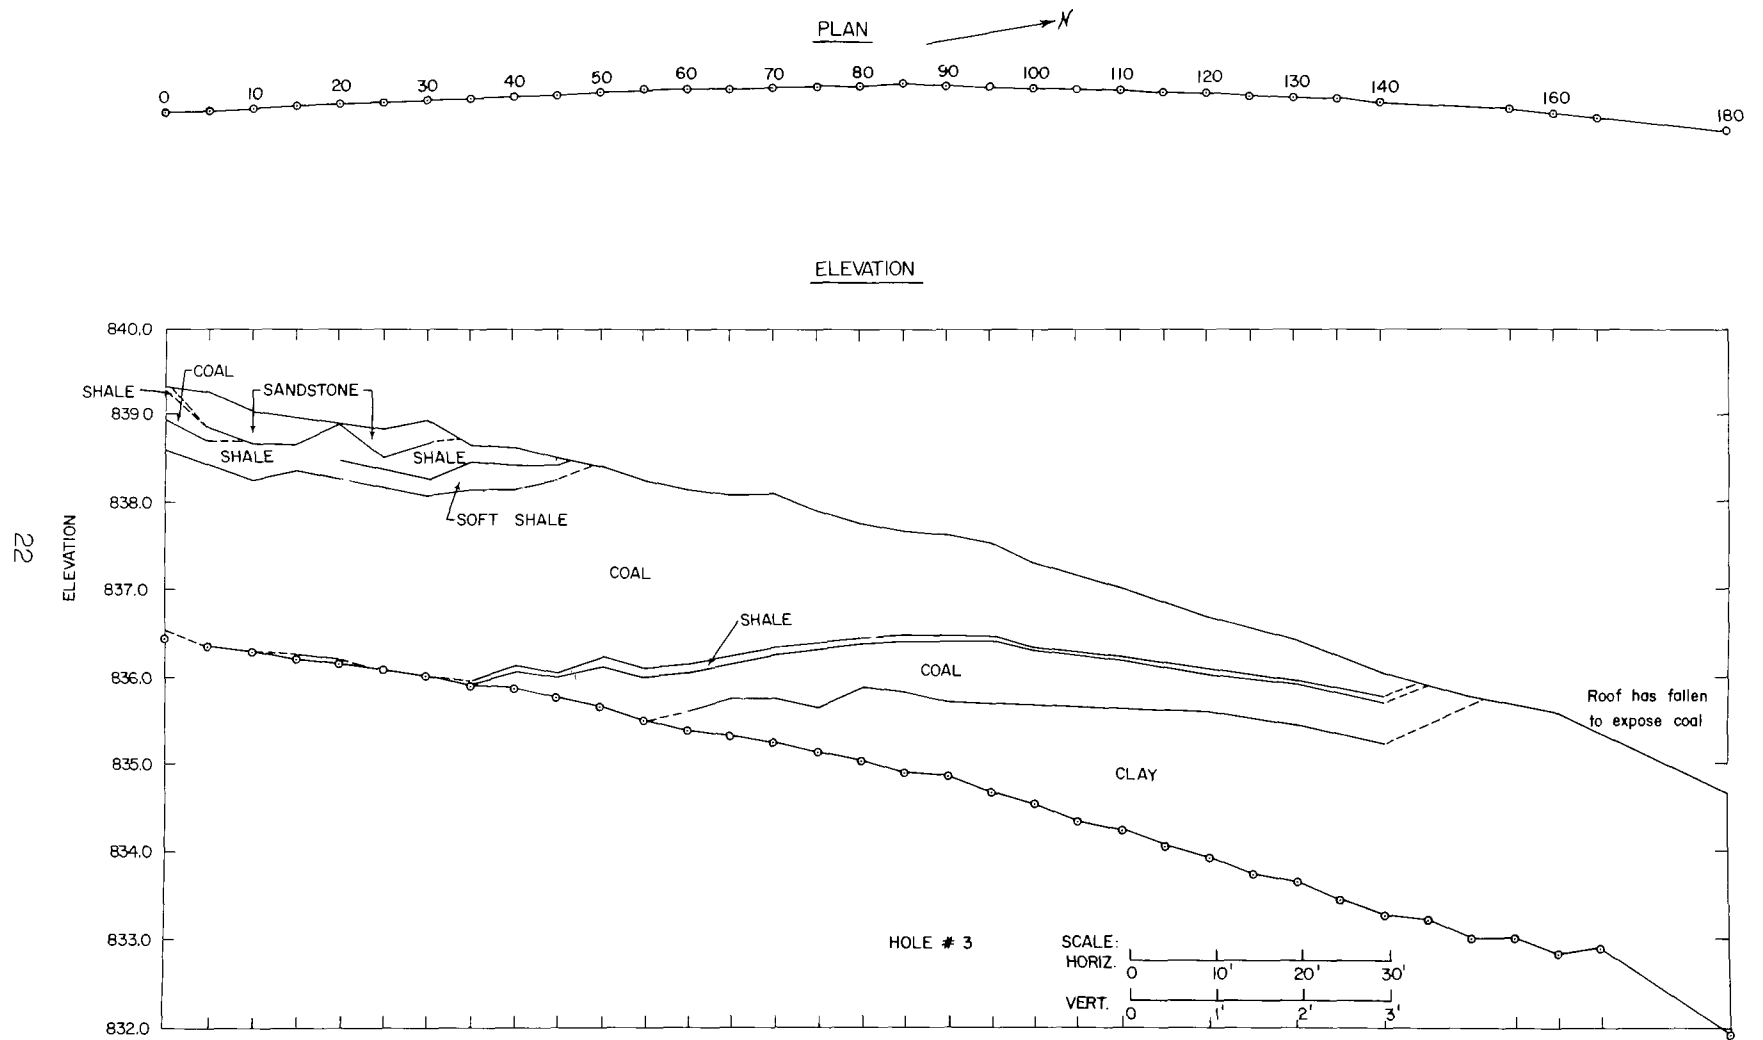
Plan and Elevation - Views of Hole No. 3
